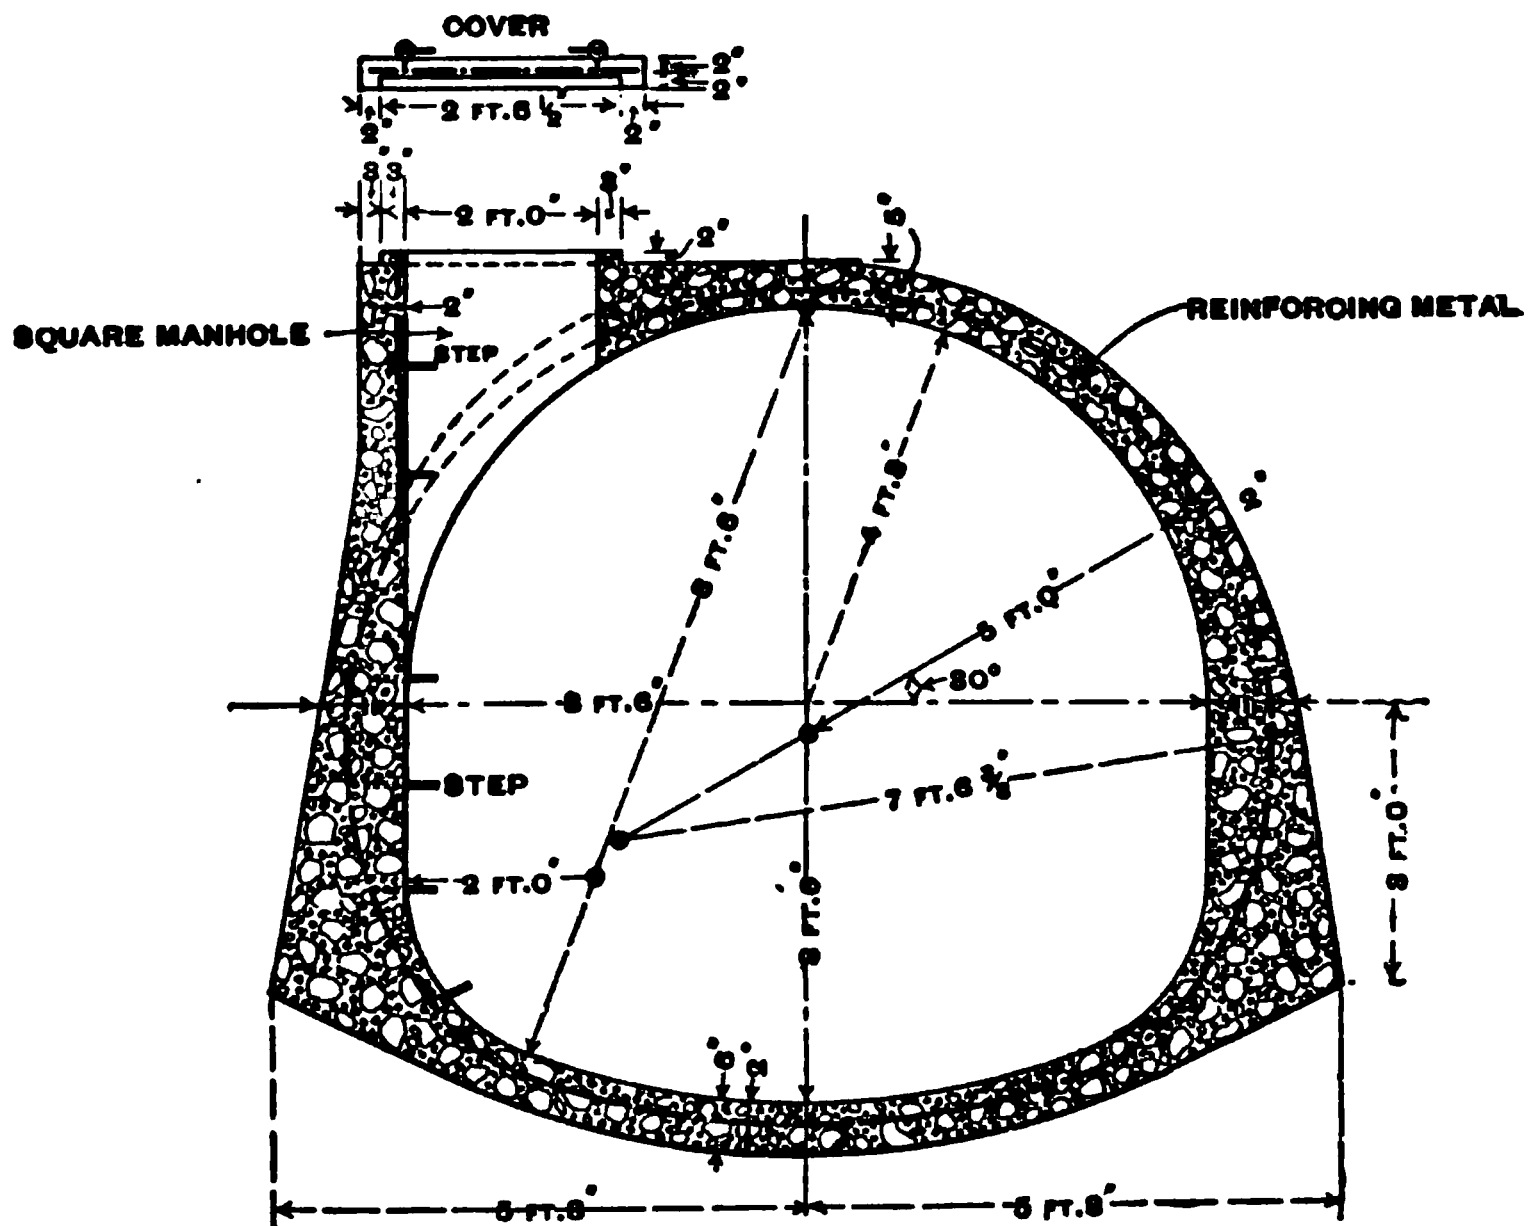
Typical Section of Jersey City Water Supply Conduit in Loose Earth. (See p. 503.)
